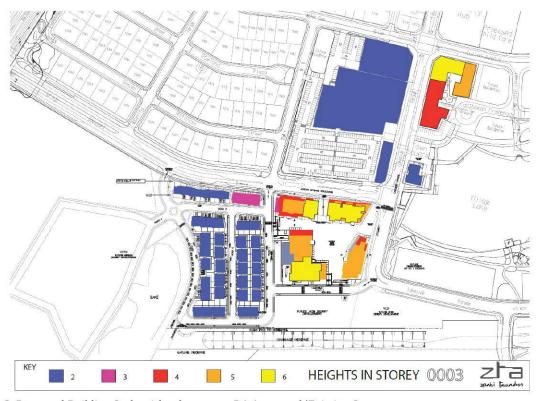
Fig G: Proposed Building Scale with relevance to DA Approved/Existing Structures
